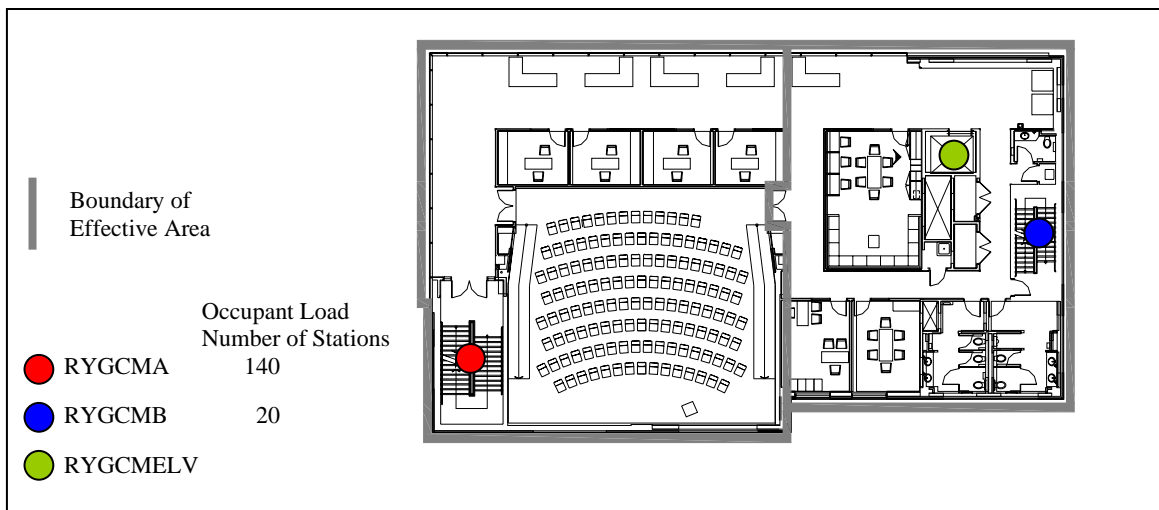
Plan indicating Seating Stations used to determine Occupant Load for Building RYGCM
